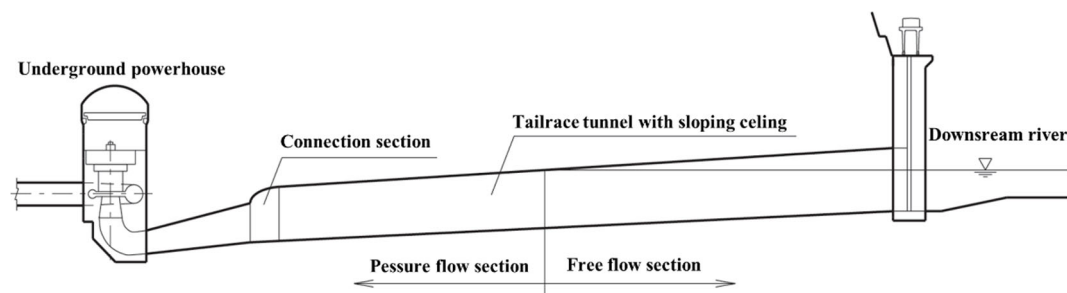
Schema of tailrace tunnel with sloping ceiling, [32].
